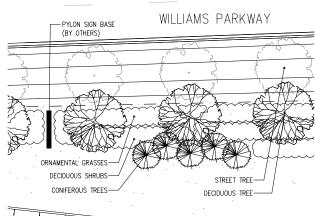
Buffer Type A1: Parking along street - Typical Plan
